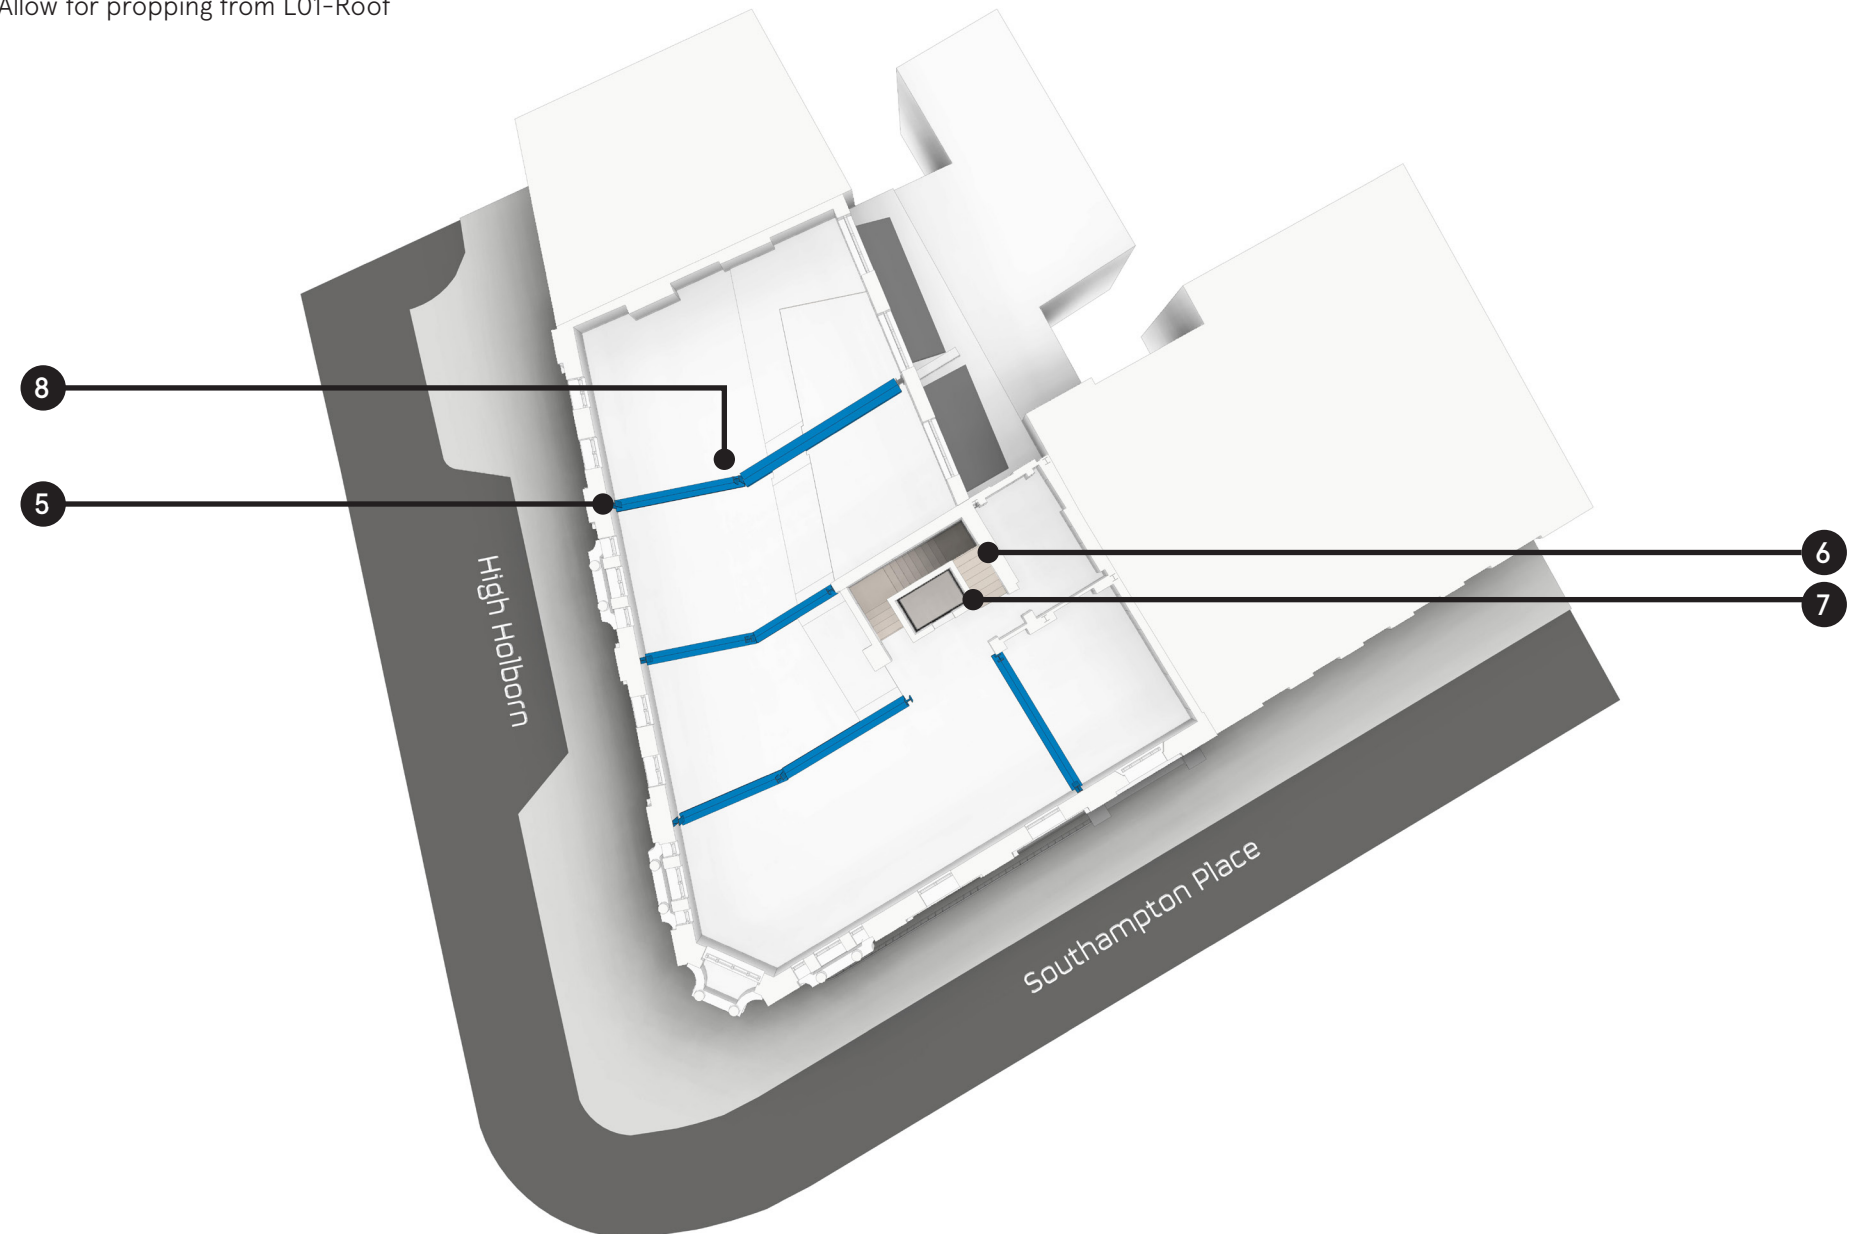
PROPOSED LEVEL 1 STRUCTURAL PLAN
